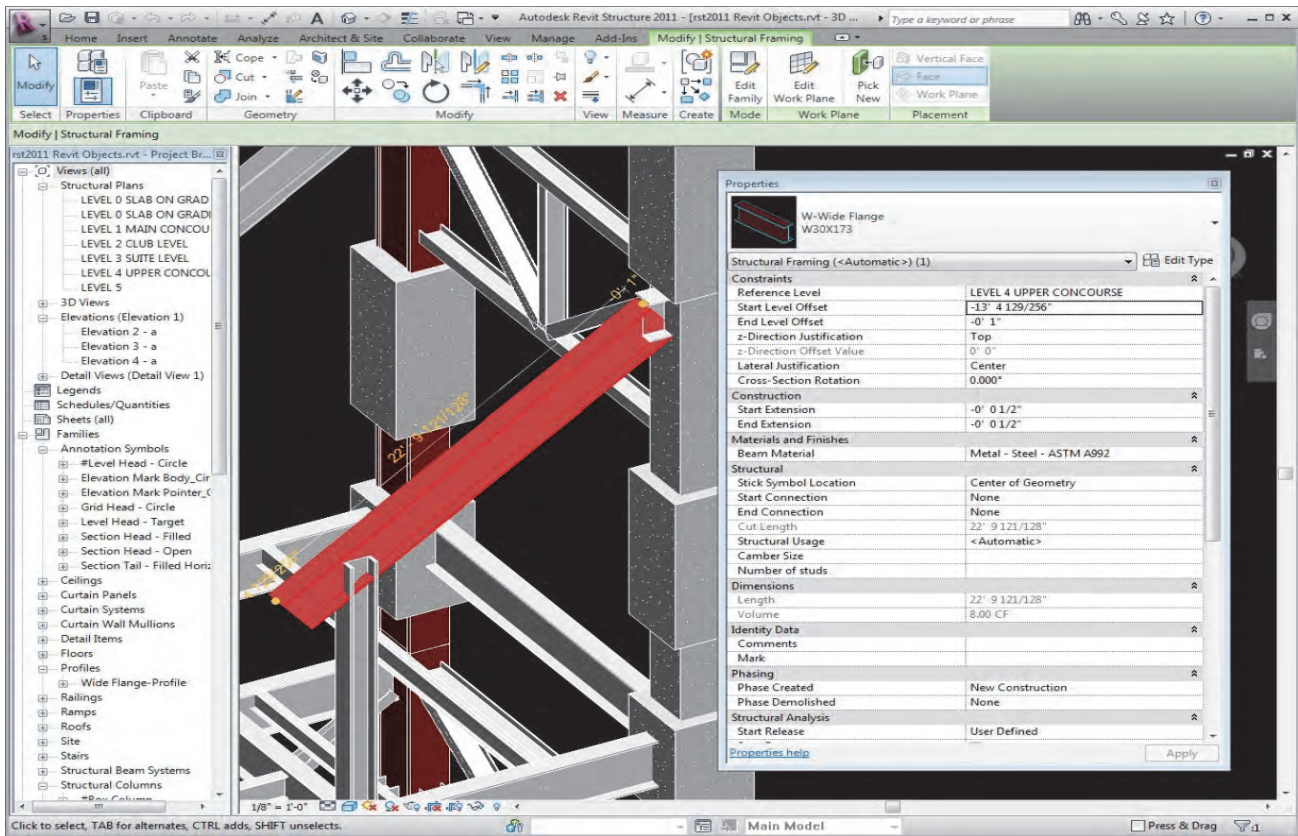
Detailed view of sloped wide-flange beam with properties.
